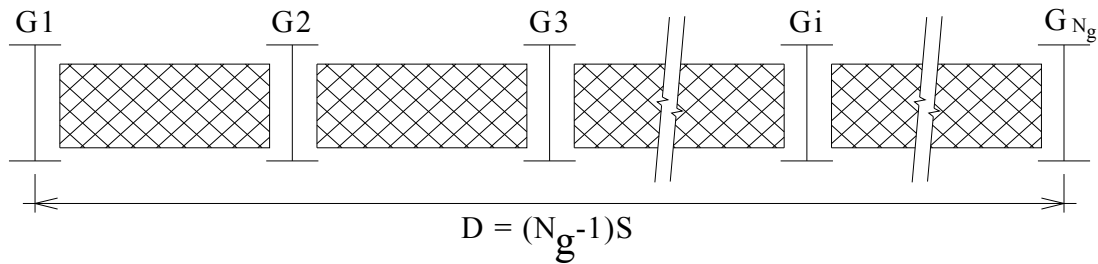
Cross Section of the Multi-Girder Curved Bridge
